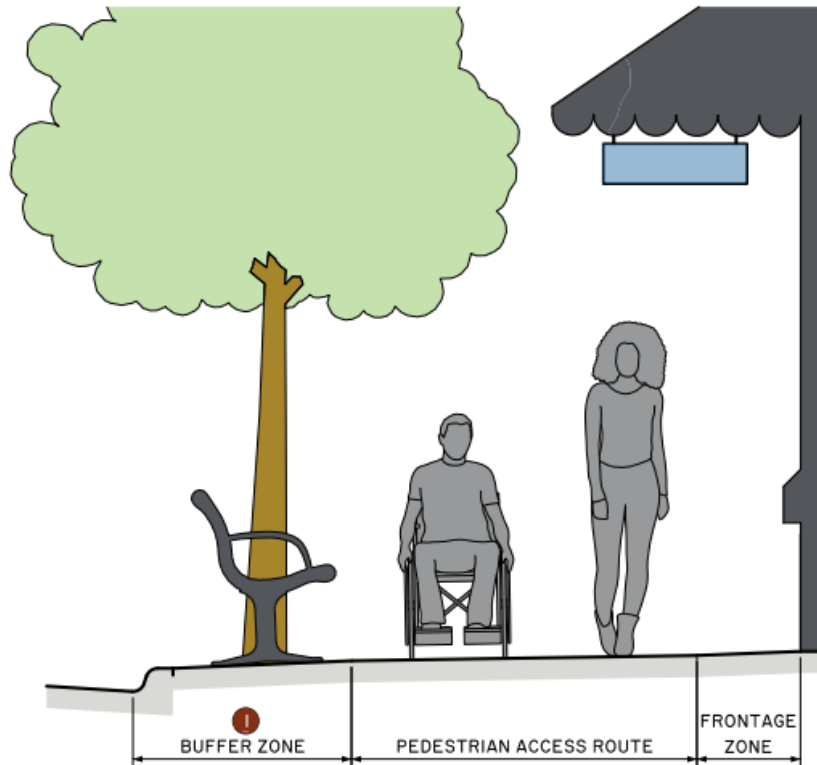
displays an illustration of various sidewalk zones (buffer, pedestrian access route, and the frontage zone).
